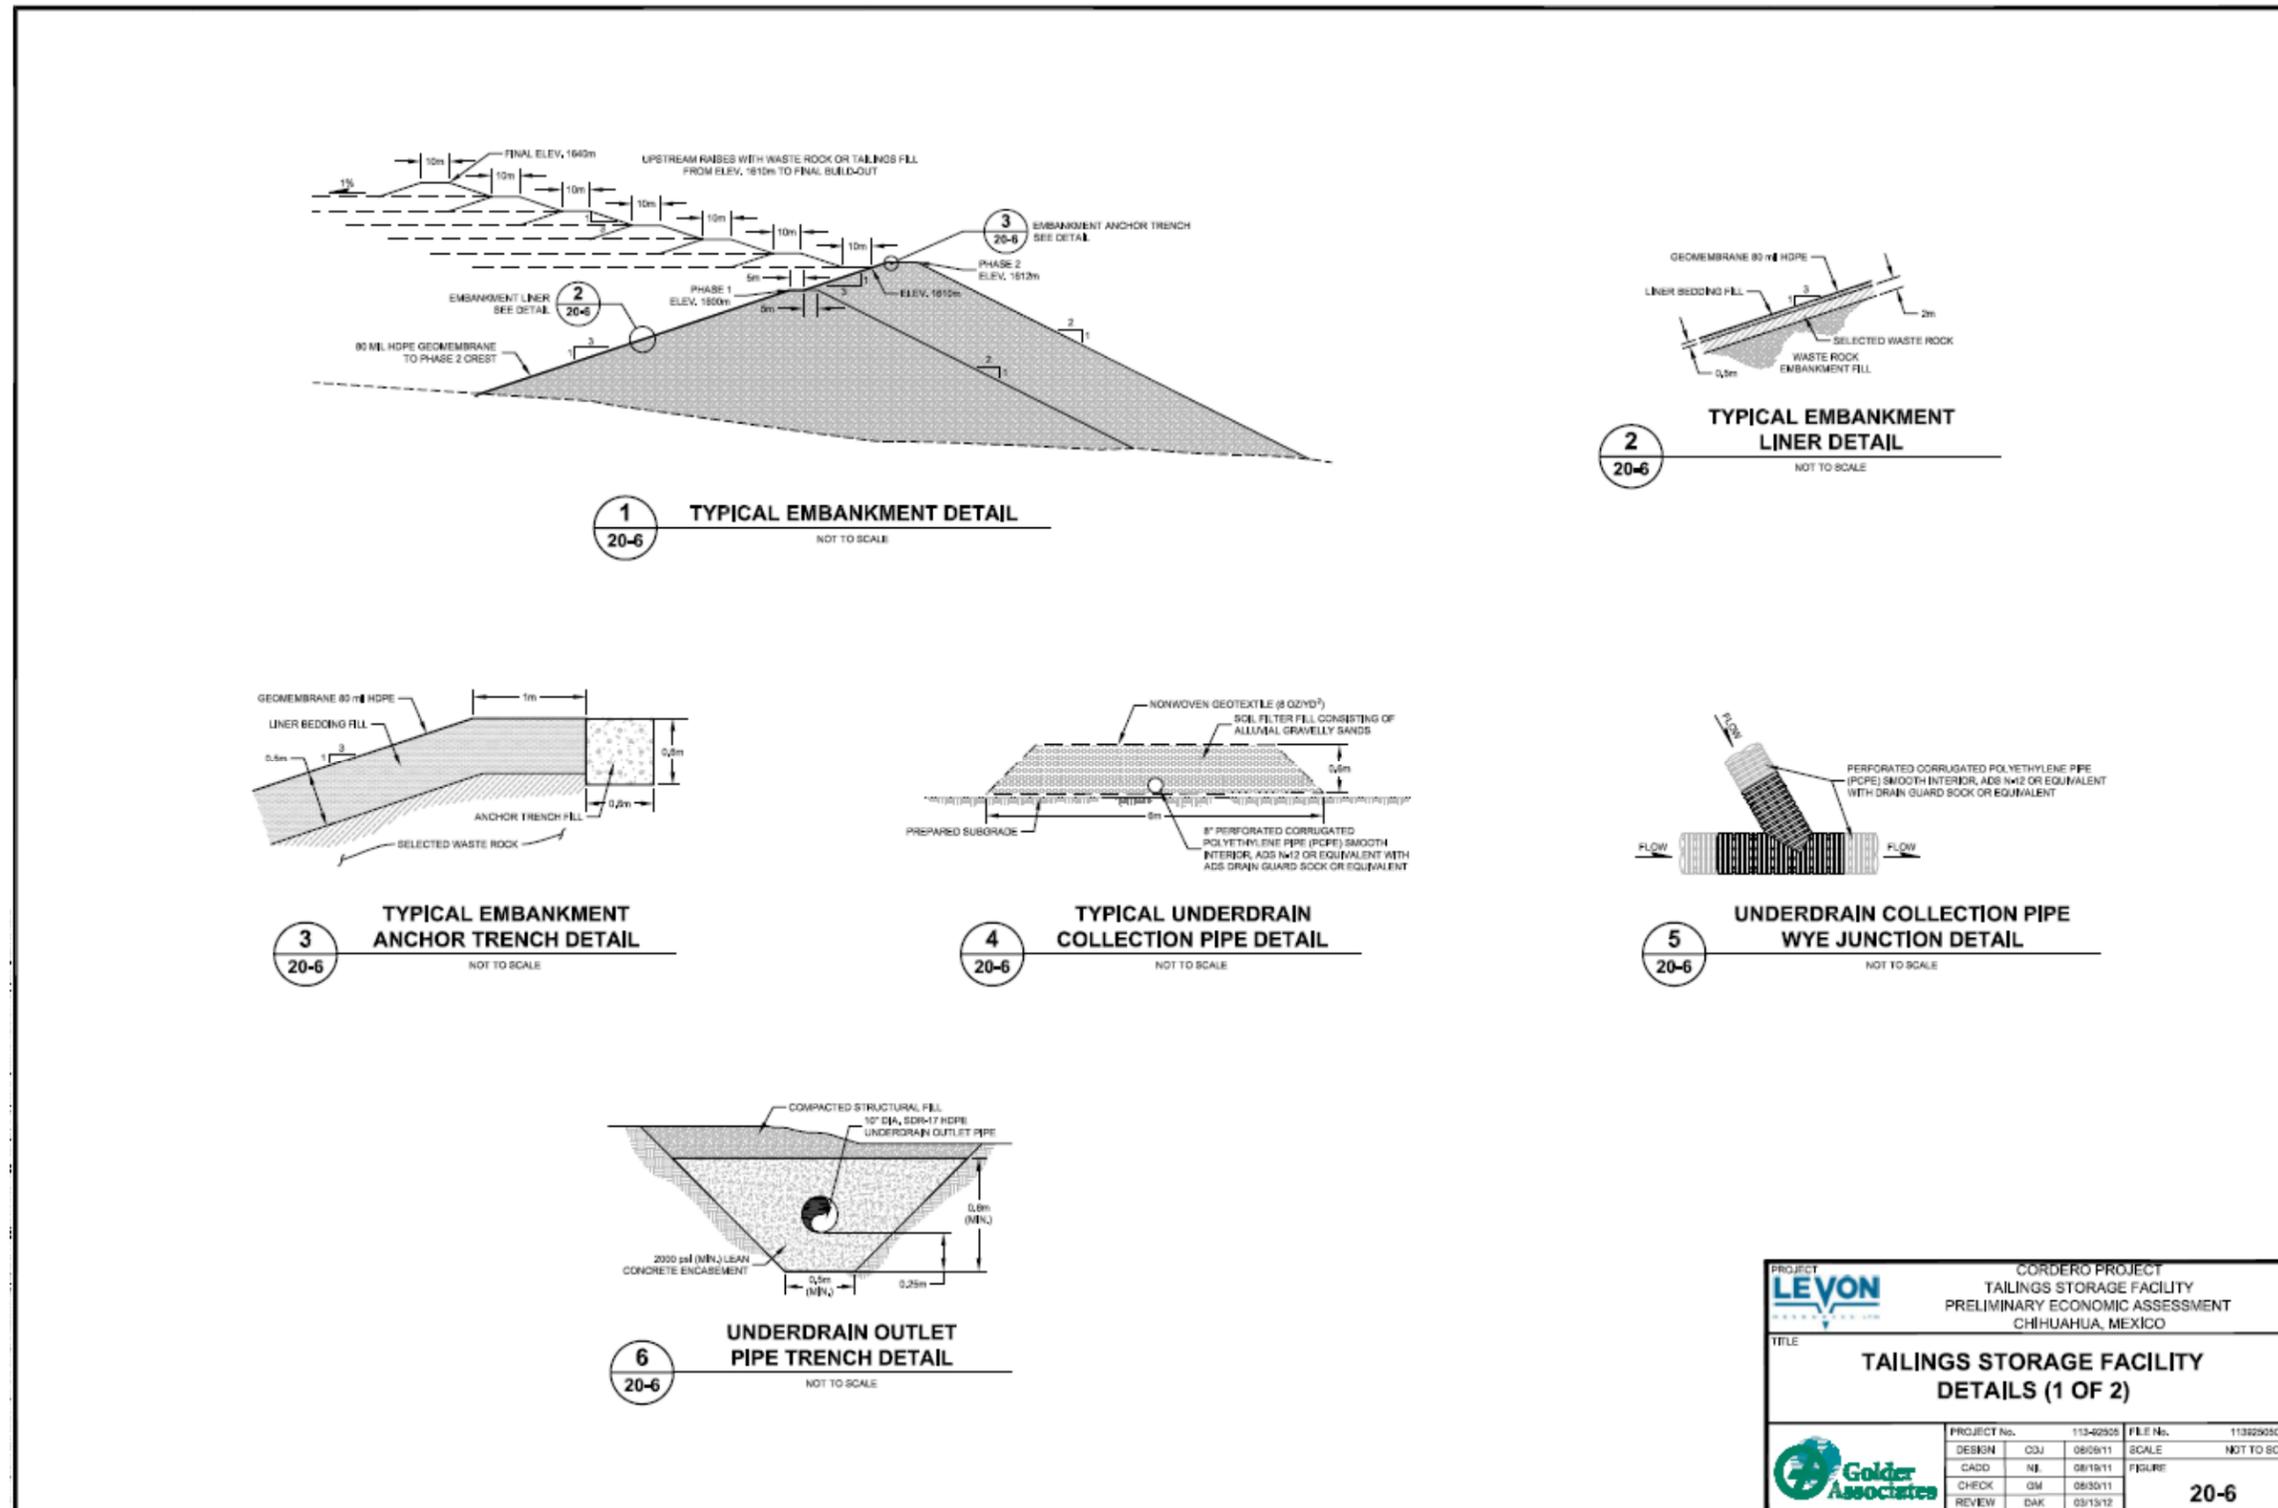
Tailings Storage Facility Details (1 of 2)
